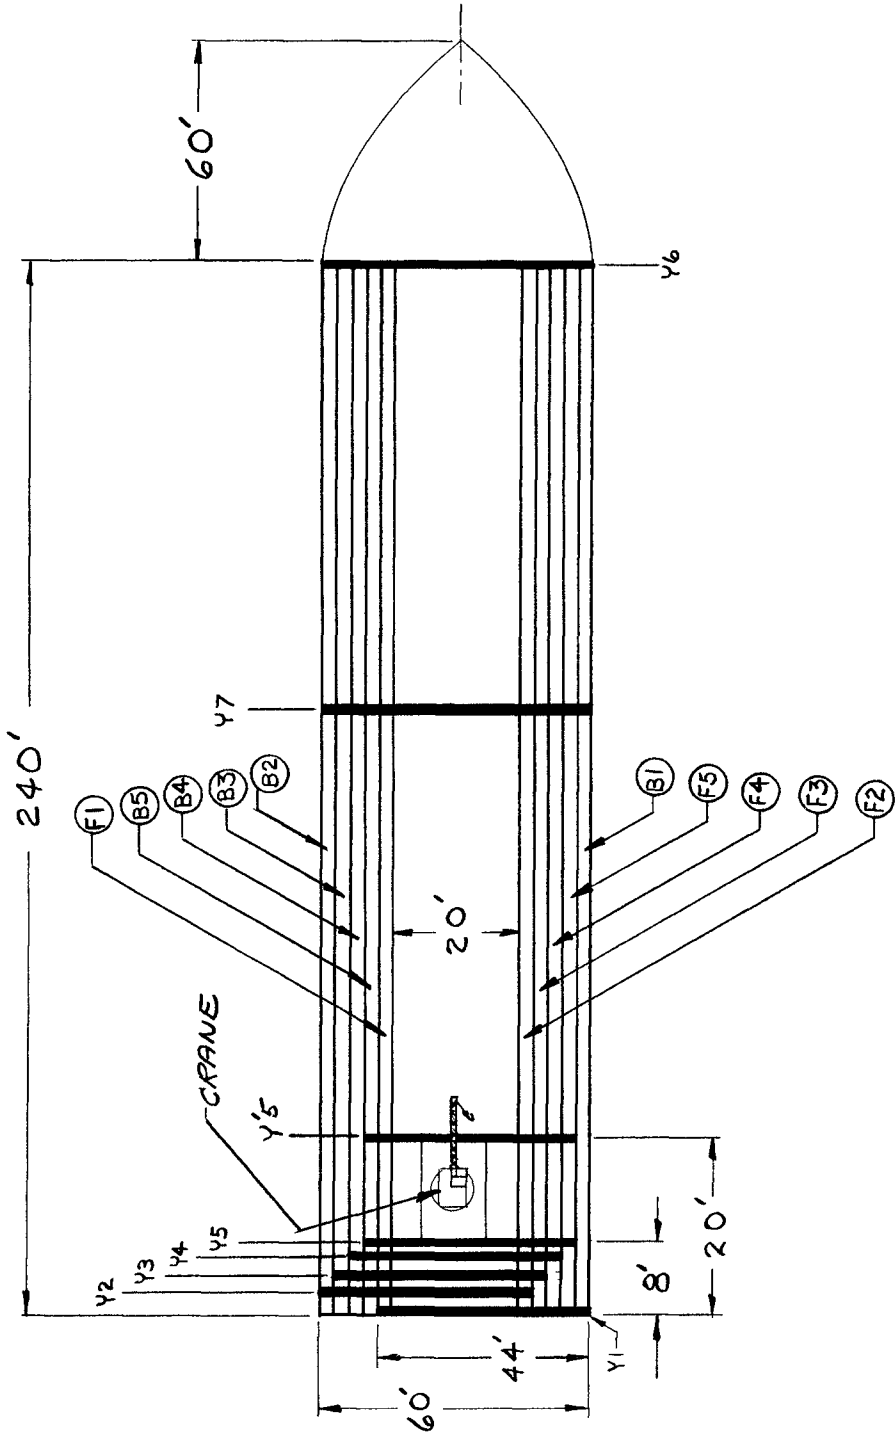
Proposed layout of breakwater elements for towing and installation.
